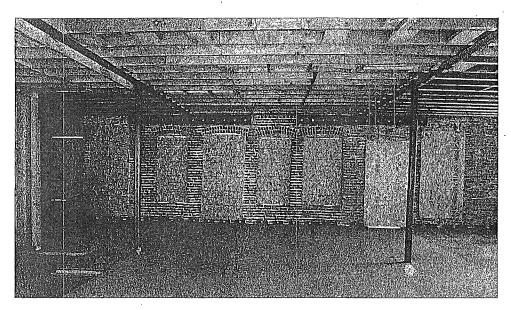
Photograph of typical west interior elevation. Note window openings covered with plywood at interior (photograph taken on 02/27/2018).
